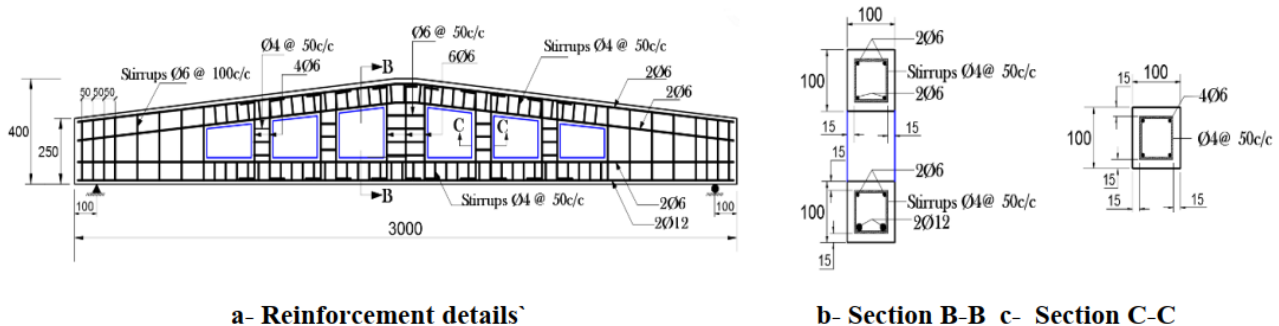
Details of reinforcement for gable beam with openings (all dimensions are in mm).
